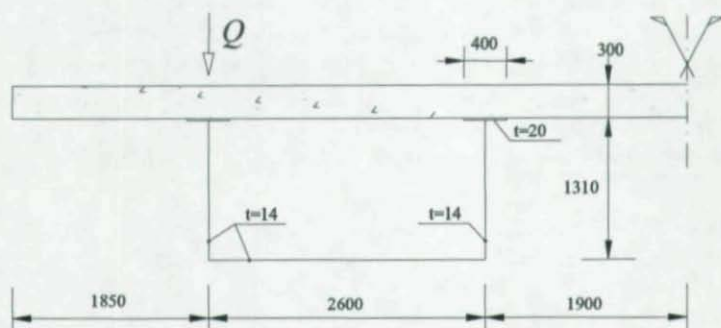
Composite bridge cross-section geometry, dimensions (in mm) and loading – due to symmetry, only “half section” is shown.
